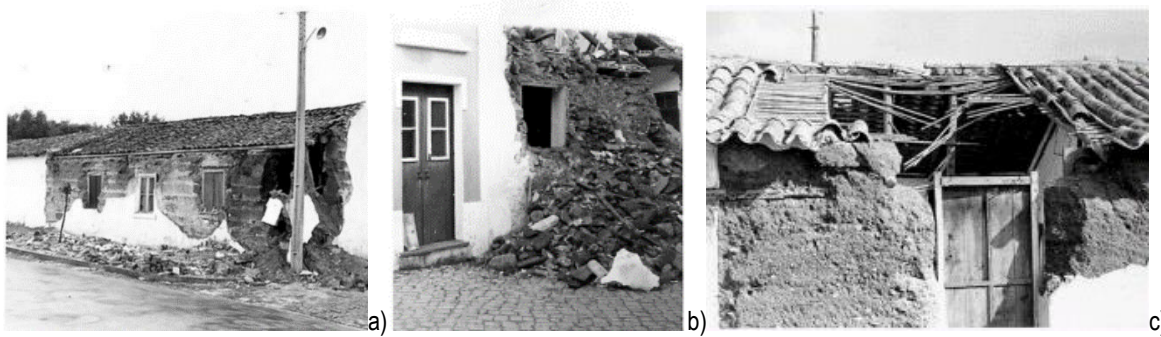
a) Partial collapse of the corner of an apparent rammed earth building in Grândola b) stone and clay masonry collapsed walls in Vila do Bispo and c) partial collapse of door head and roof in the village of Longueiras (Trêpa, 1969).
